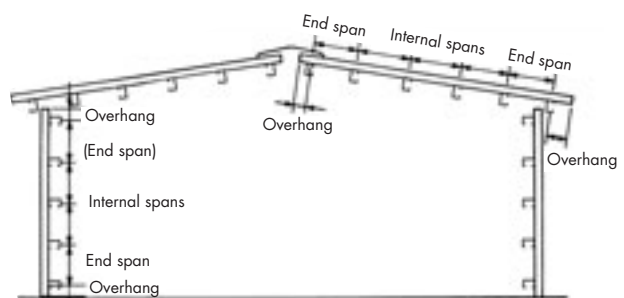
B End Spans, Internal Spans and Overhangs
